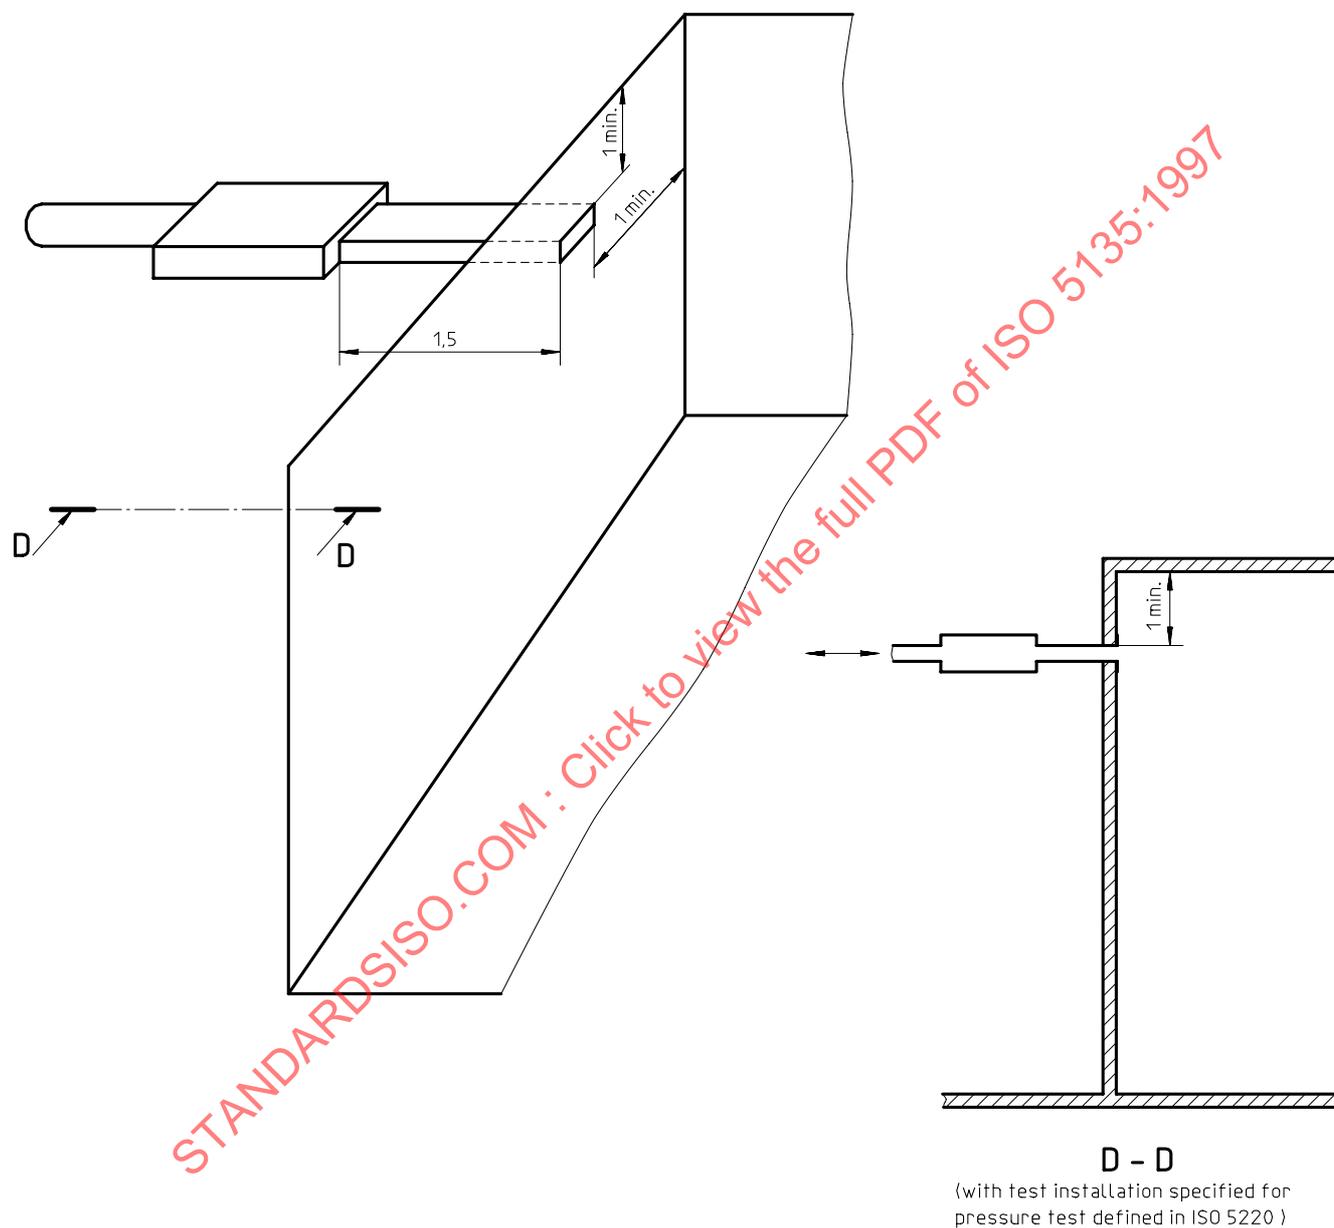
Mounting detail for air-terminal units installed outside room boundary
